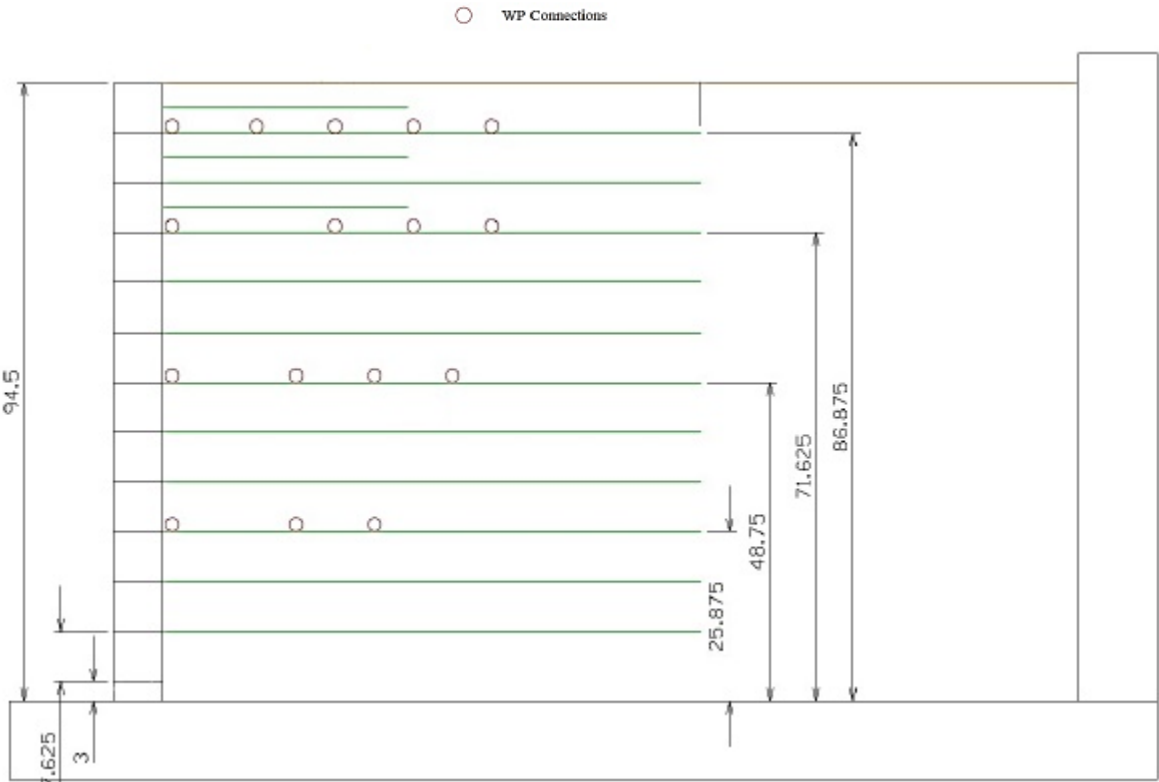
Schematic layout of GRS abutment models (image provided by Doger, 2020)
